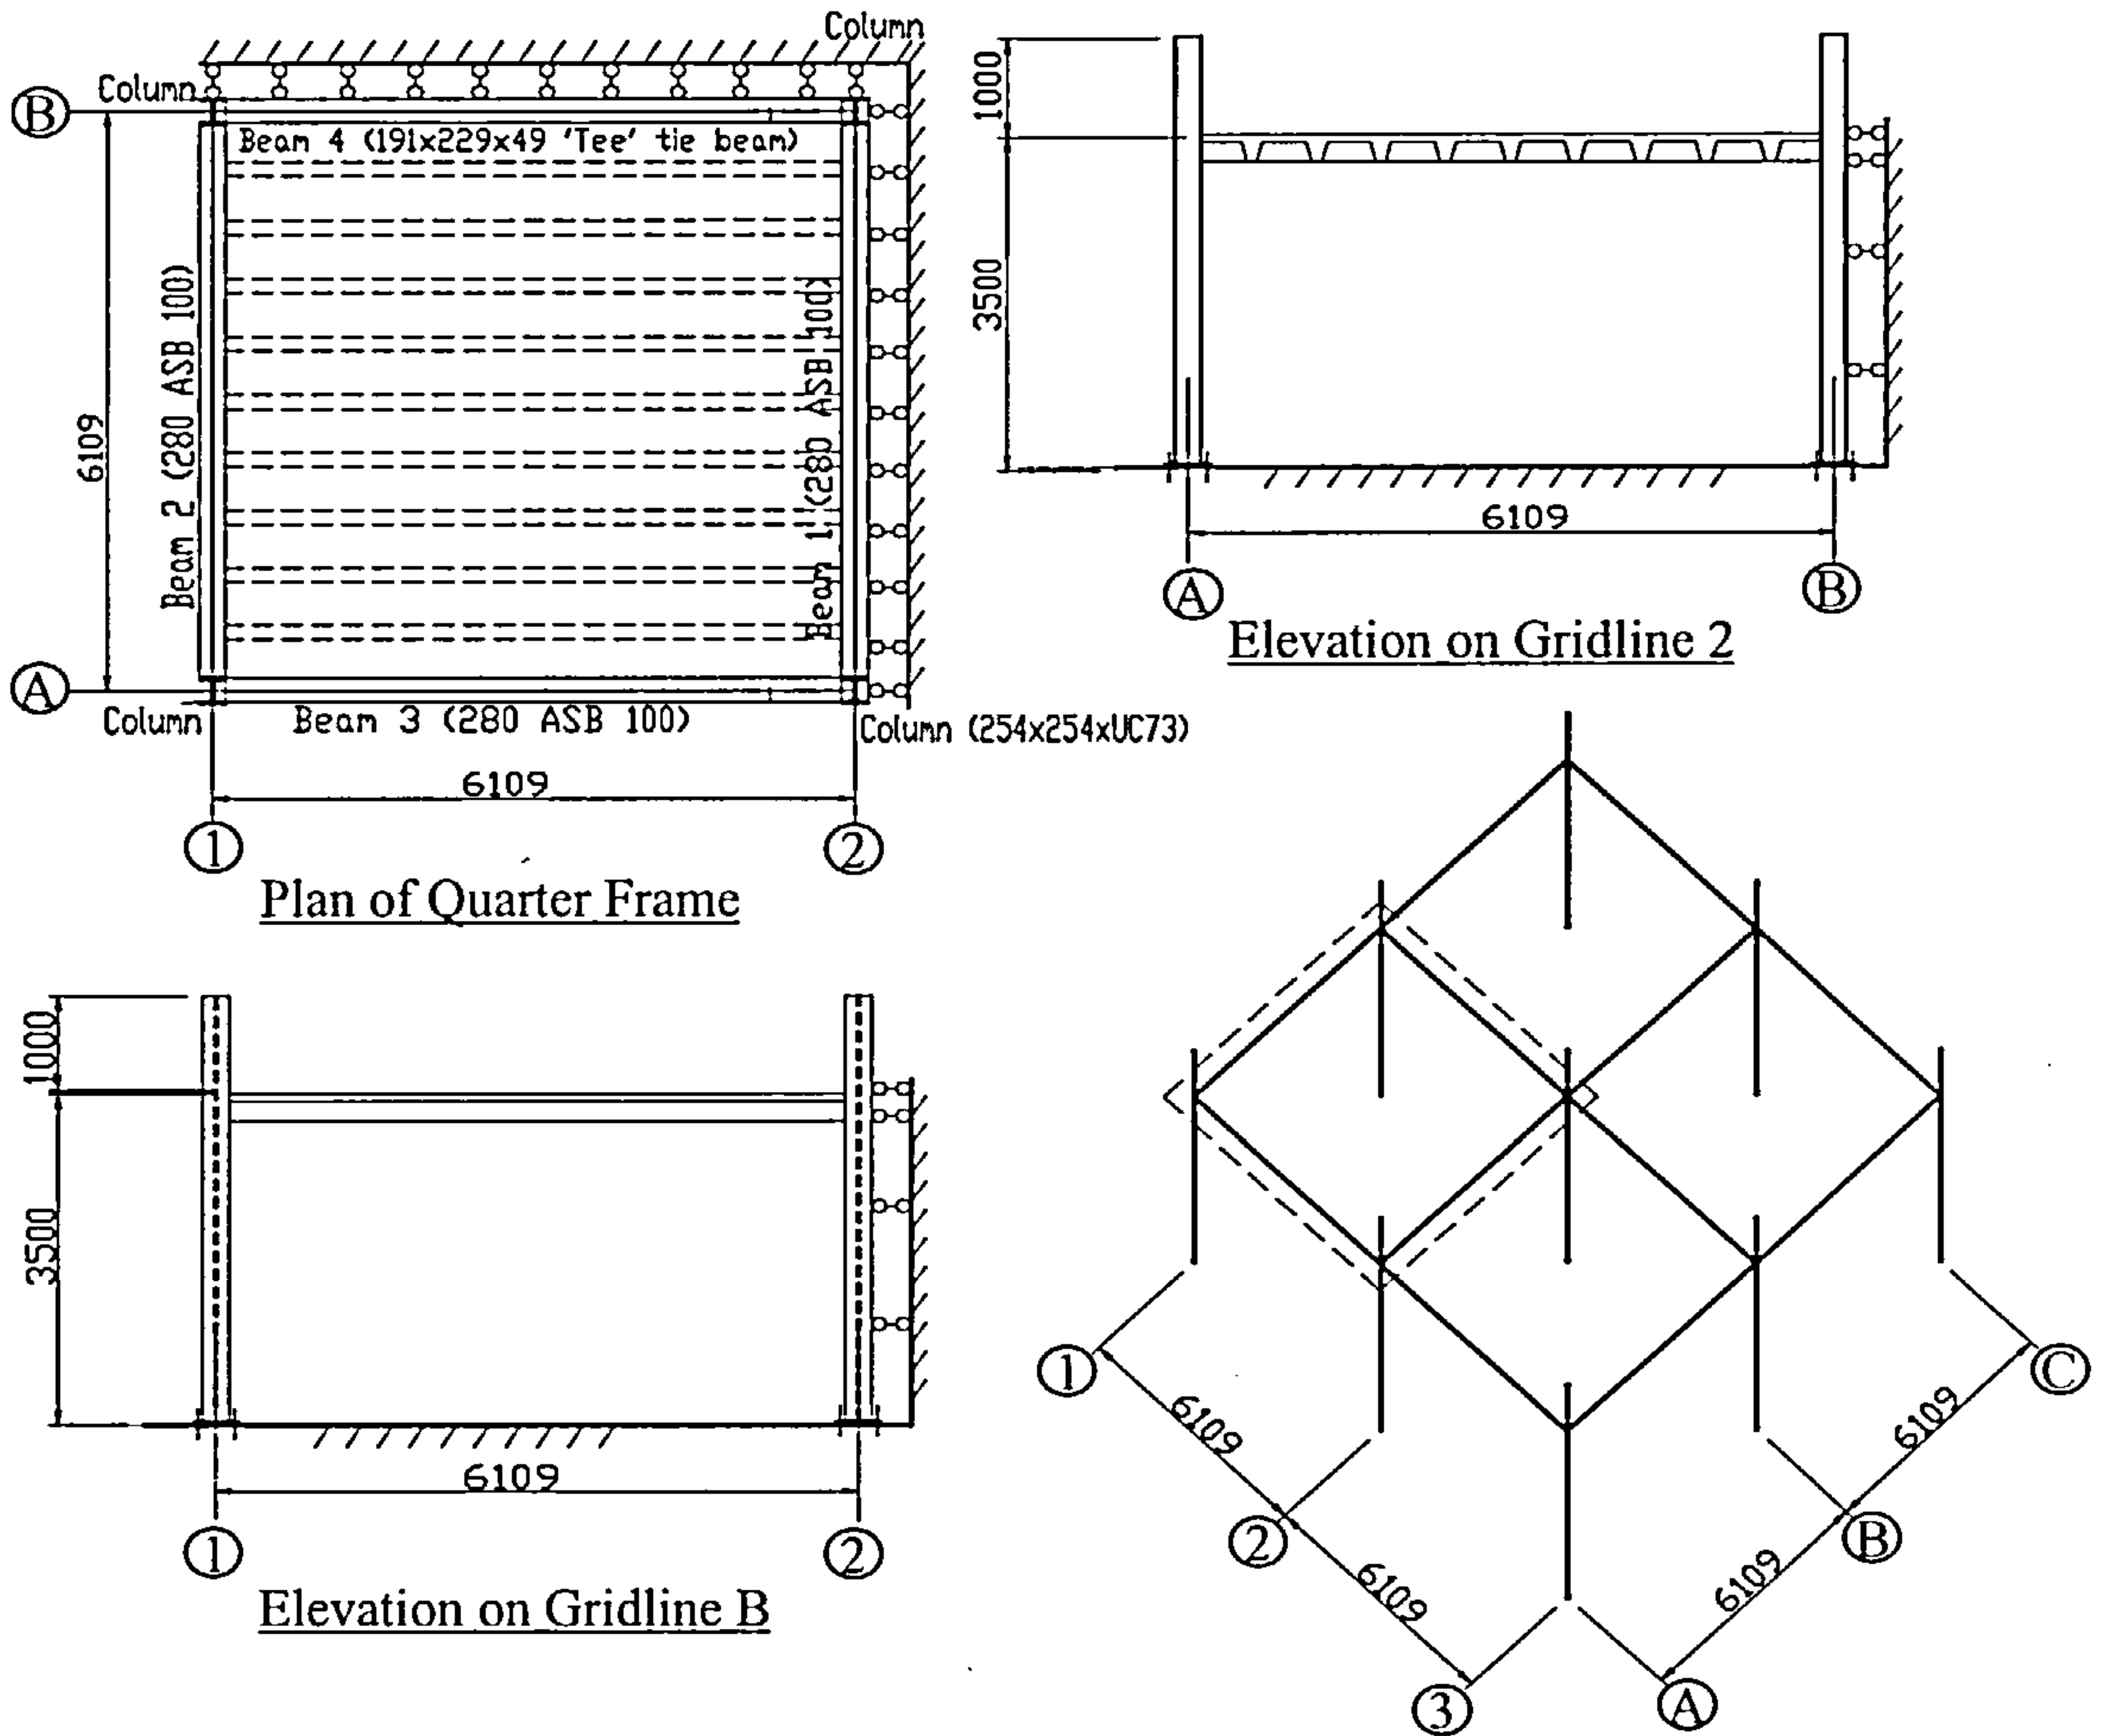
Details of one quarter of full-scale fire test on a Slimdek Floor System (All dimensions in mm).
